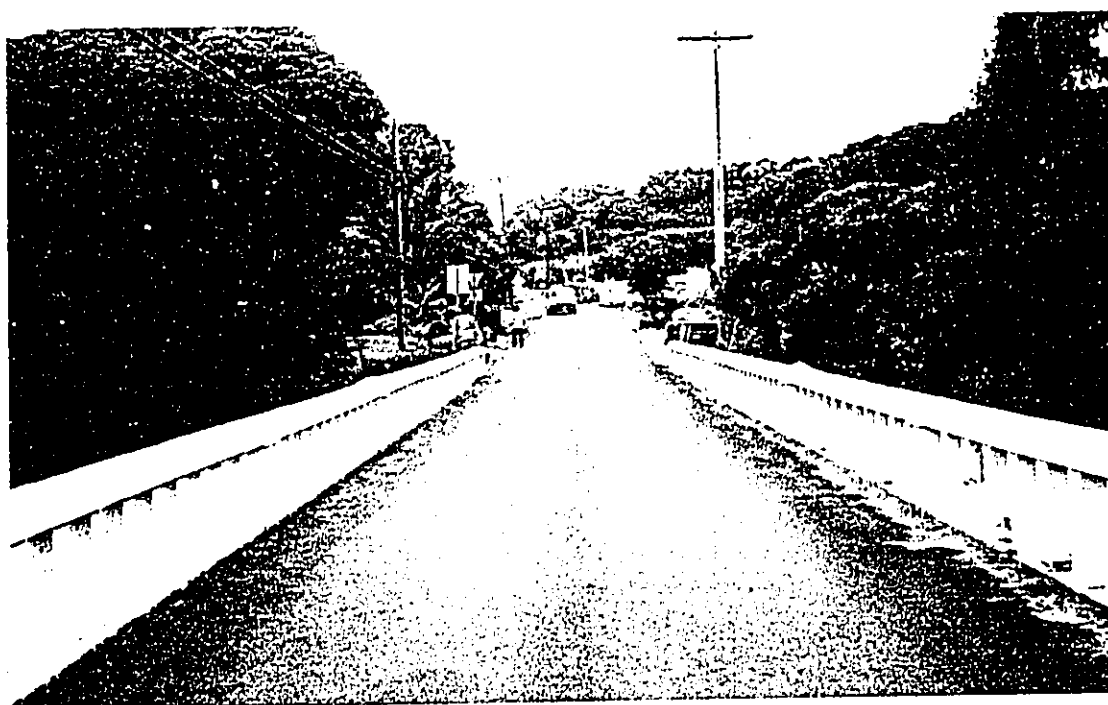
View of Waiohonu Bridge looking north-west (upstream)
